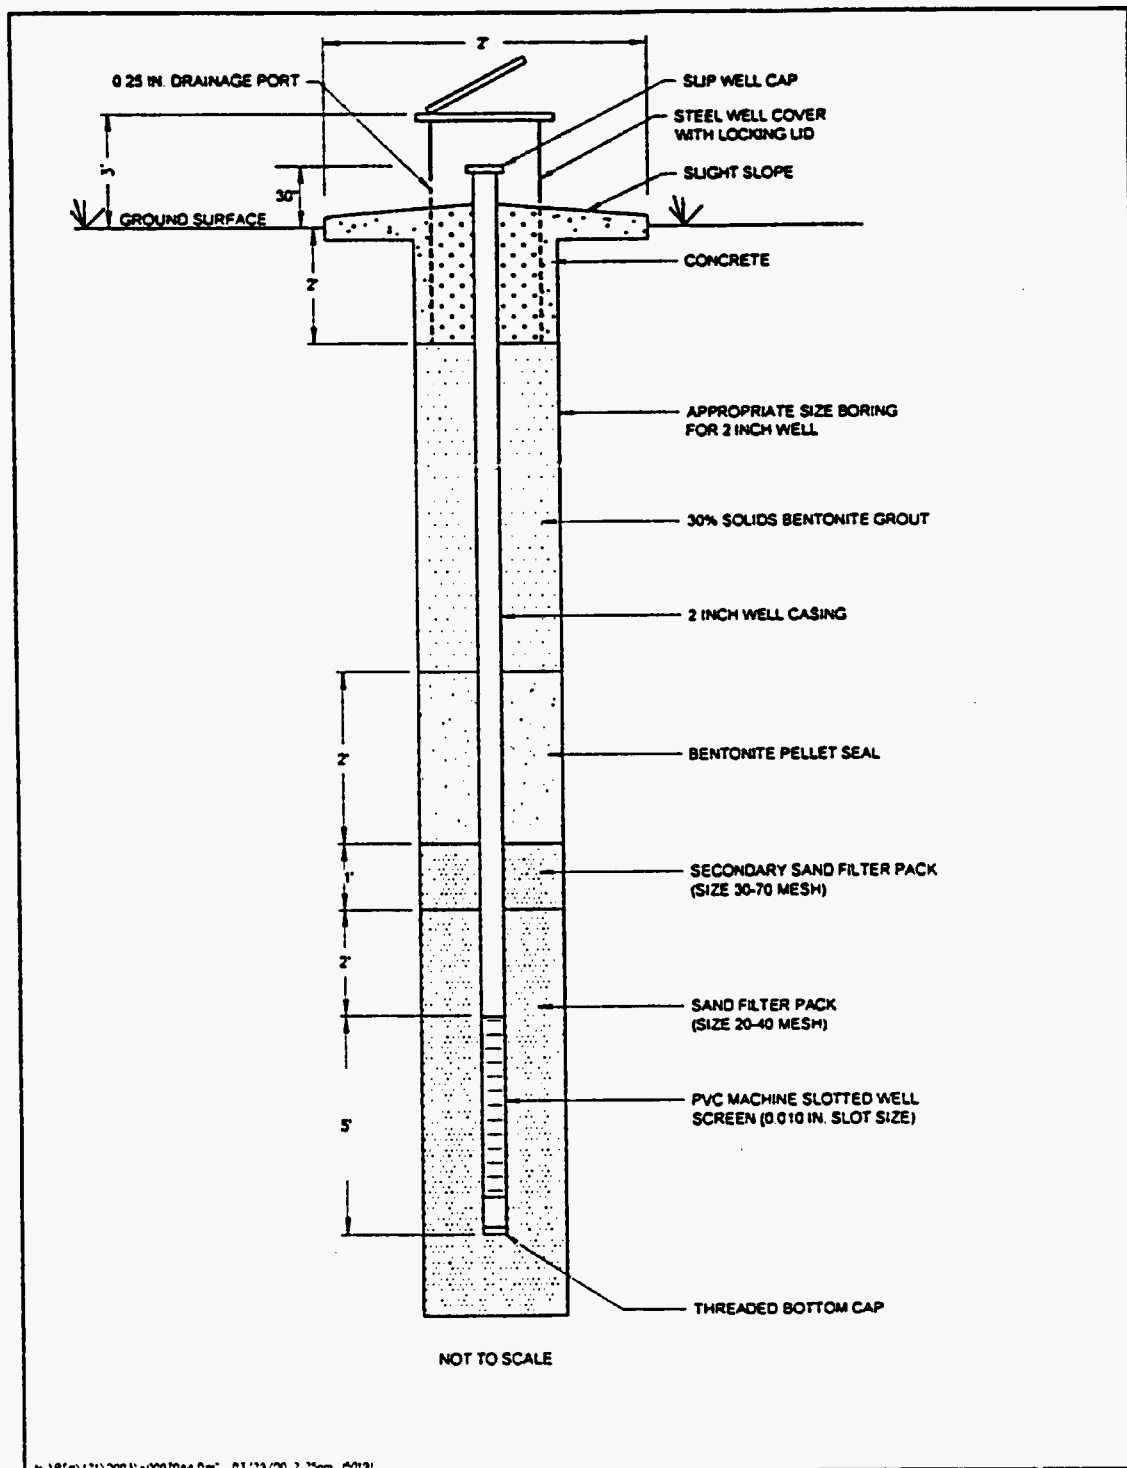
Typical Well Completion Detail; Above-Ground Completion
